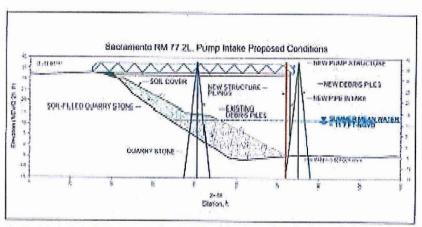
Proposed conditions cross section at SAC RM 77.2L at the pump structure location.
